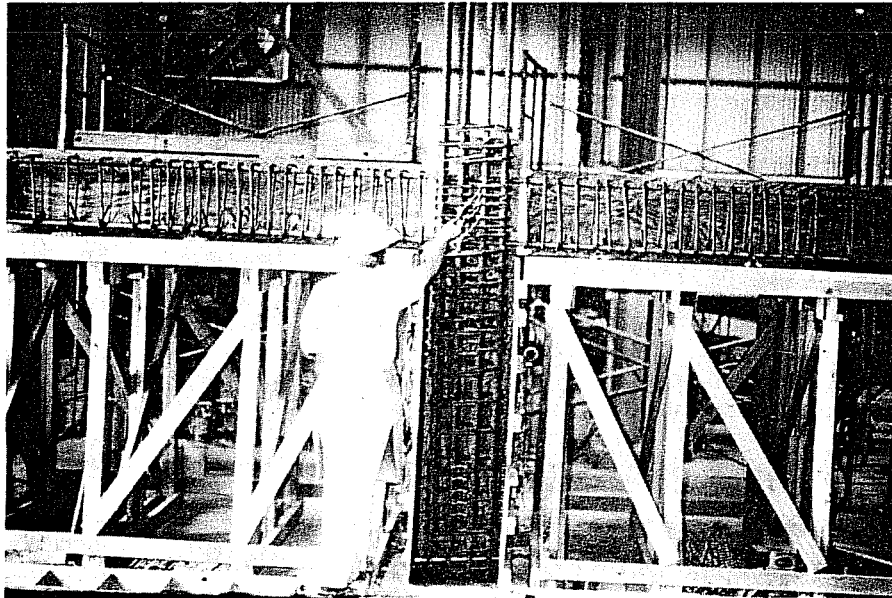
Completed lower column and main beam cages with joint hoops in position
